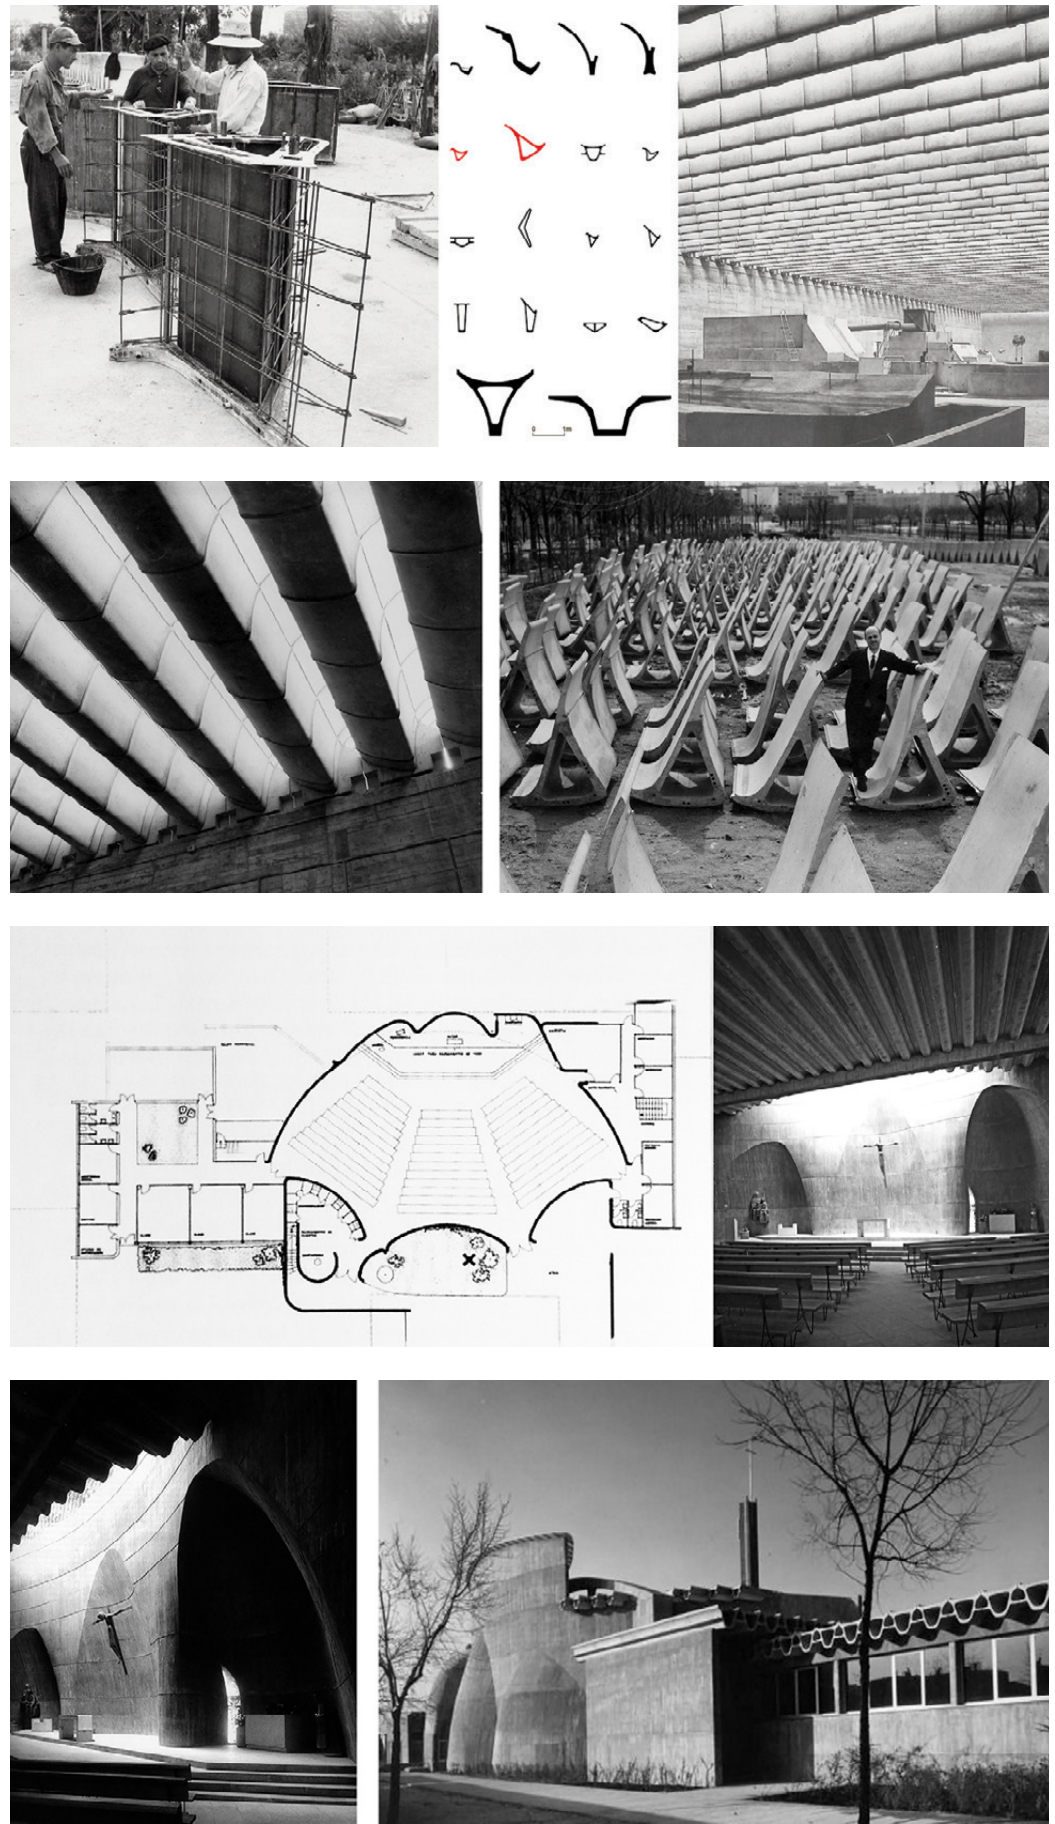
| Center for Hydrographic Studies (1960) in Madrid, designed by Miguel Fisac: View of the formwork of the beam module; Interior photo of the model workshop; Drawings of the sections of the ‘bone’ beams. The beams used in the Center for Hydrographic Studies are shown in red (credits: Centro de Estudios Hidrográficos; section redesign by C. Pirina).
